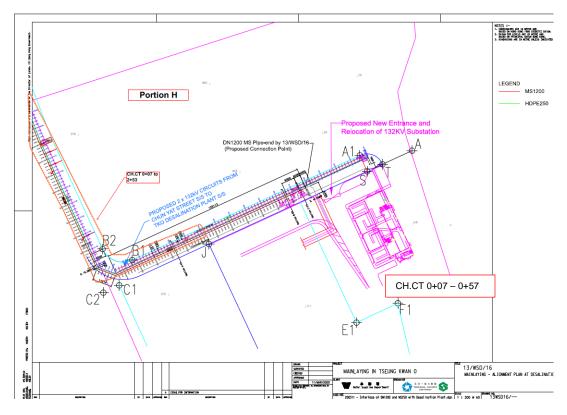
Location Plan for CH.CT 0+07 – 2+53
